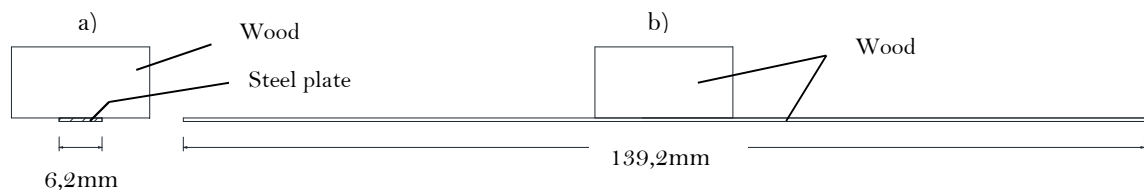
a) Cross section of a wood beam reinforced with a steel plate ; b) Transformed cross section of a wood beam reinforced with a steel plate
